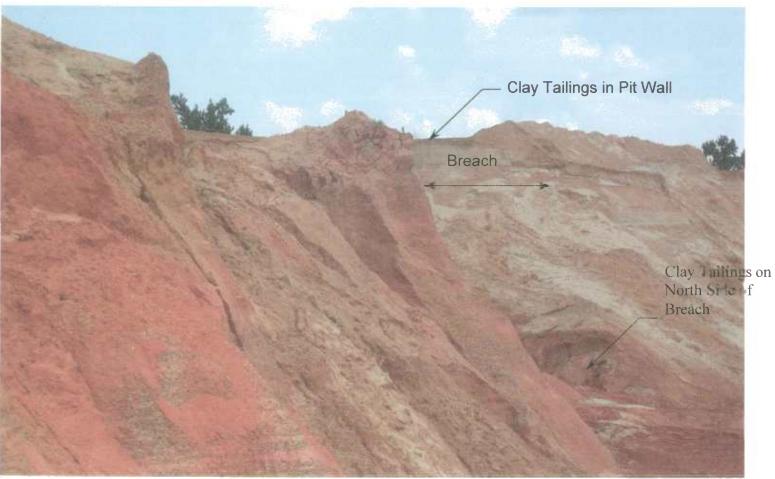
View of the pit wall adjacent to the failure looking southeast. This shows the clay tailings overlying the natural sand and gravel near the top of the pit wall. It also depists clay tailings in the lower part of the pit wall on the southern side of the breach.
